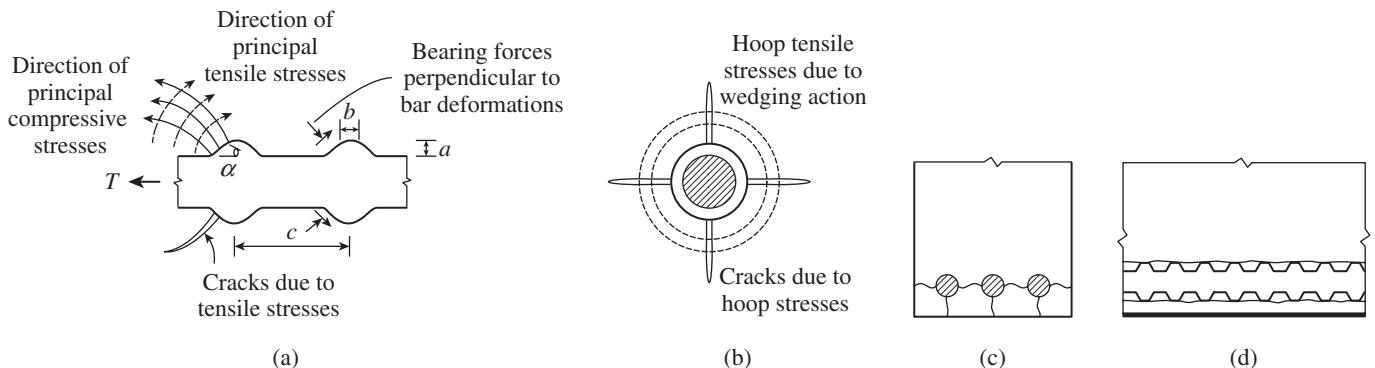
Cracking mechanisms in bond (a) Deformed bar with deformation face angle α and possible cracks (b) Formation of splitting cracks parallel to the bar (c) Splitting cracks between bars and along the reinforcement (d) Shear crack and/or local concrete crushing due to bar pull-out
